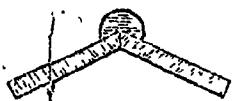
is a cross-section through the boards which protect the ridges or hips of a wooden roof, showing how the joint is covered by a wooden bead. Scale = $\frac{1}{20}$.
